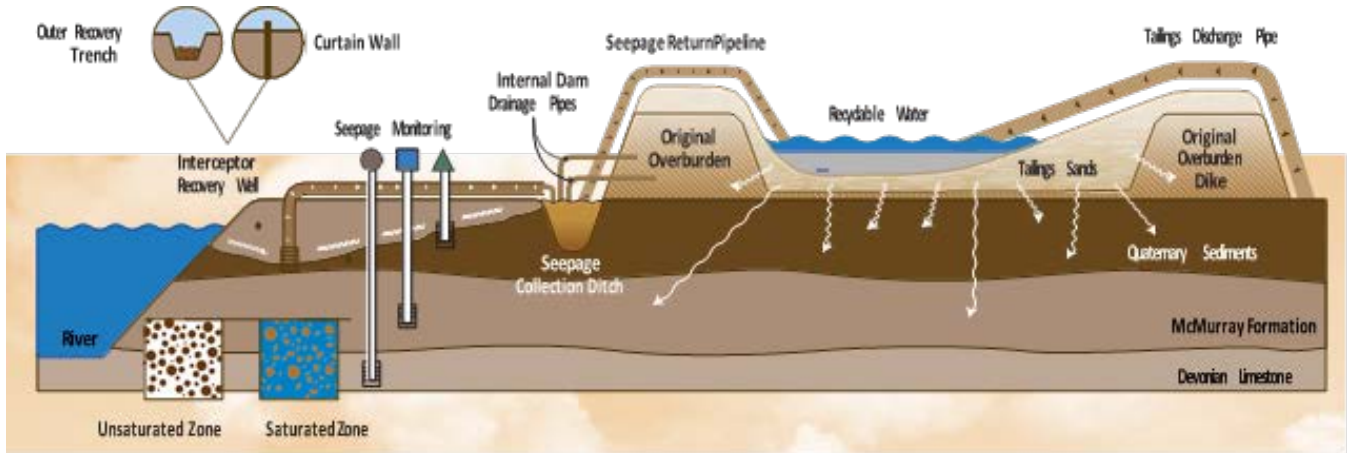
Cross-Section View of Tailings Seepage Recapture and Monitoring Systems (Government of Canada, 2015)
